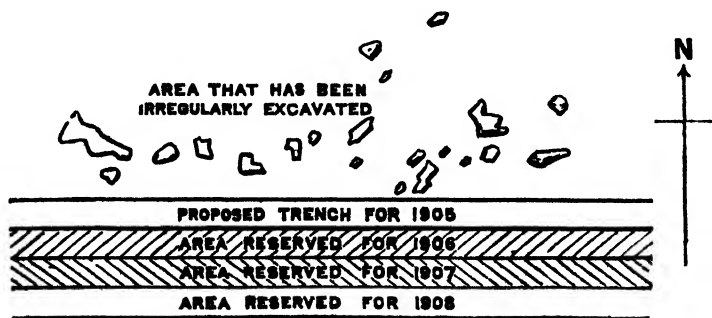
Plan of portion of proposed systematic working at Bhowanipur.
